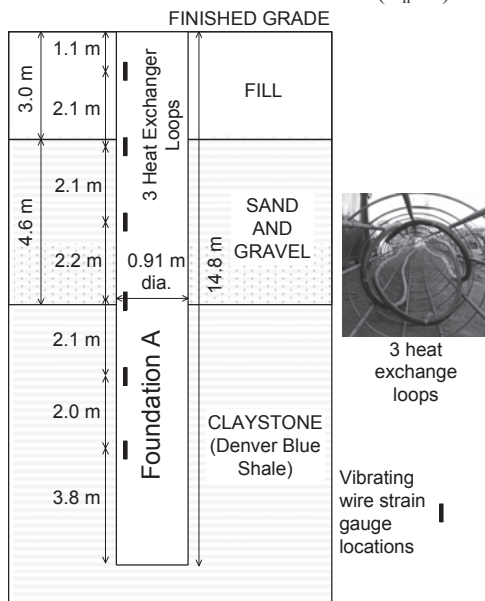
Soil stratigraphy and layout of foundation instrumentation
